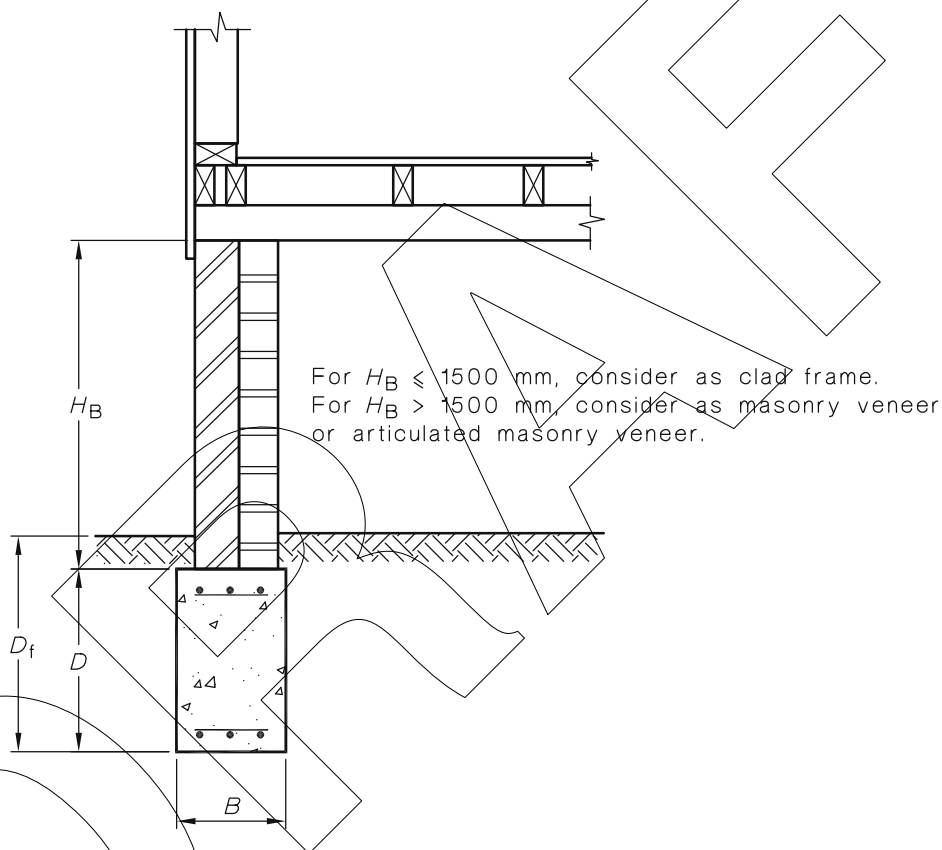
STRIP FOOTING SYSTEMS, CLAD FRAME
